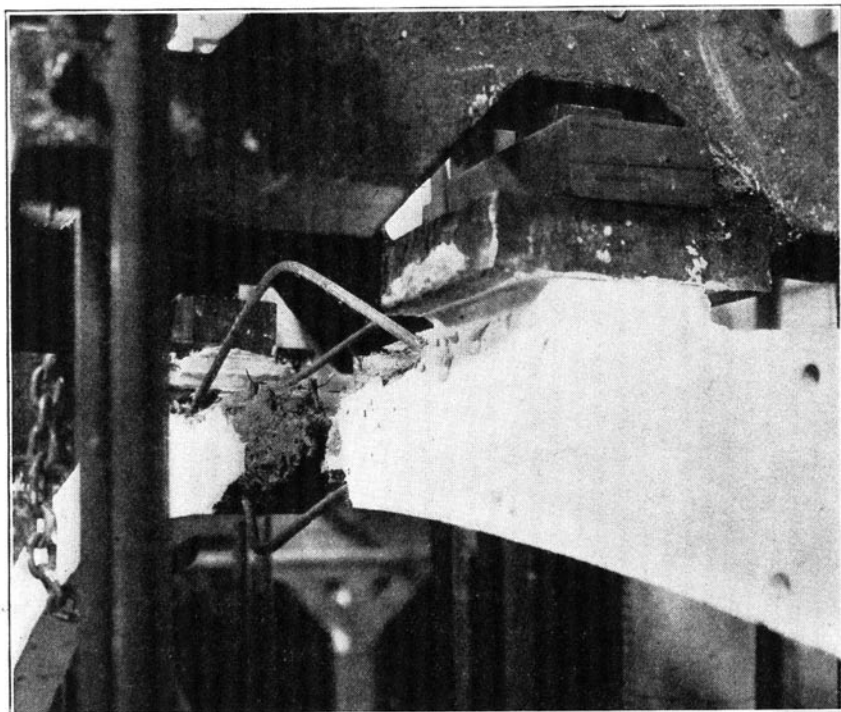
FAILURE OF ARCH 26-3 AT CROWN
